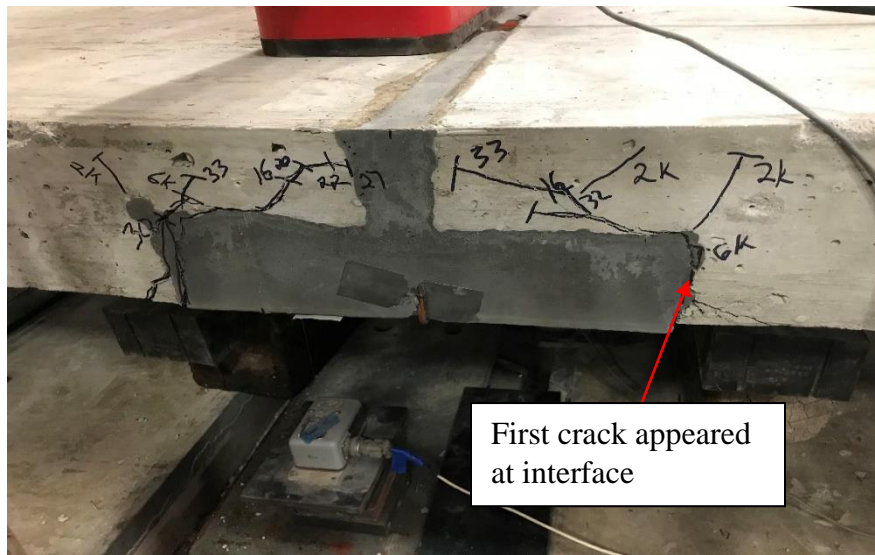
Cracks propagating from the bottom of the slab to the top at failure on the north side
